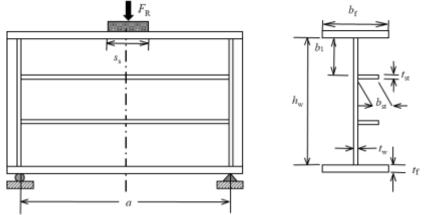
A plate girder with two equi-spaced longitudinal stiffeners subject to patch loading.
